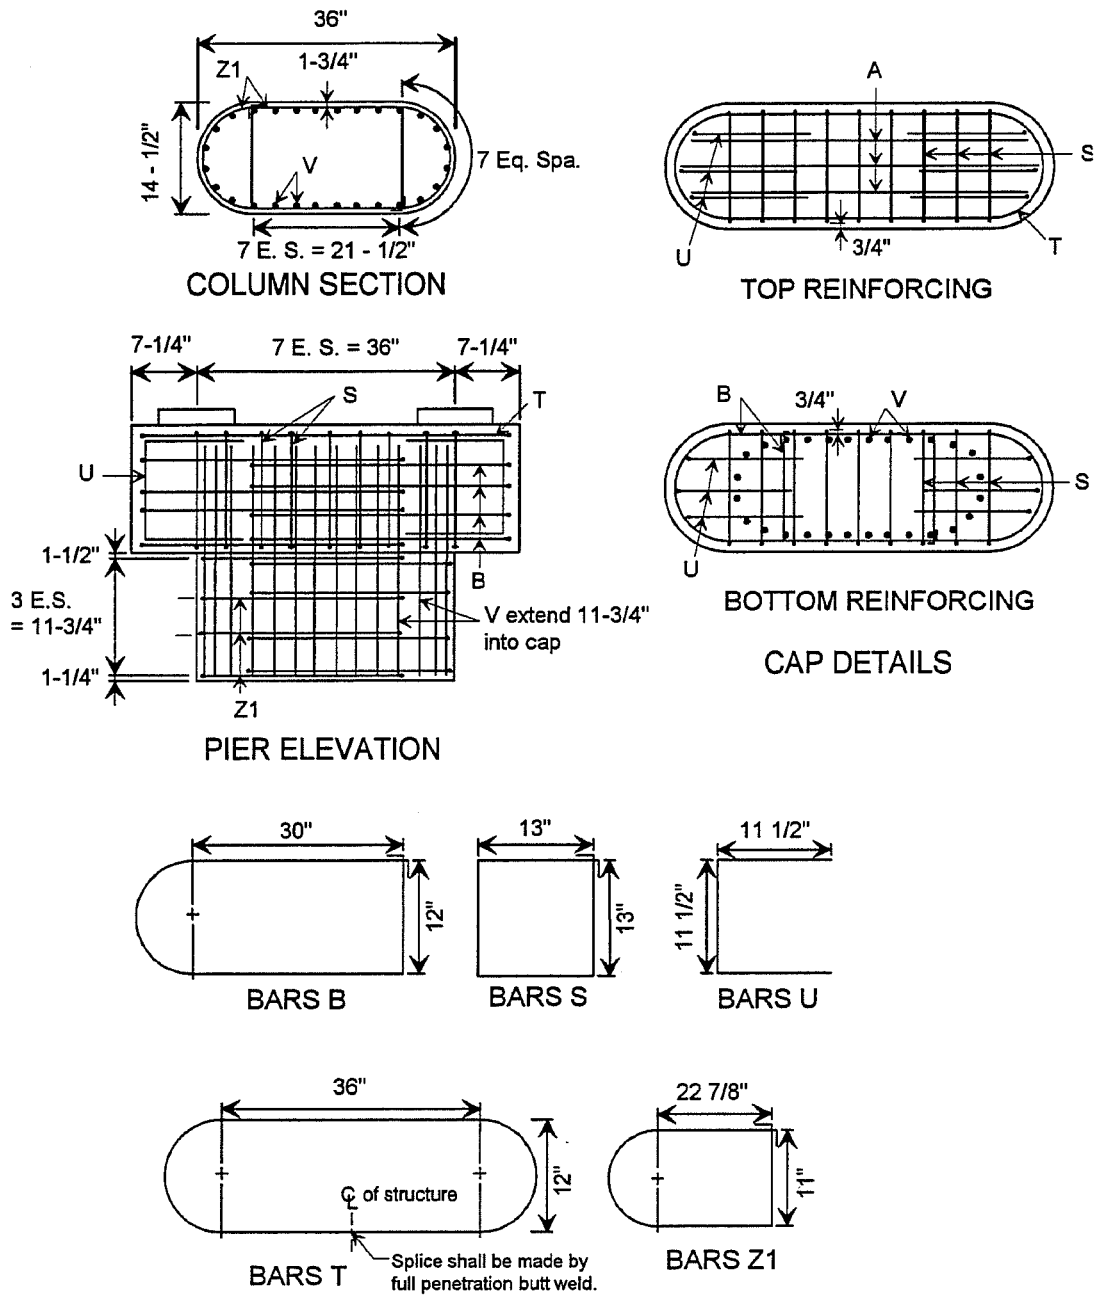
Steel Reinforcing Detail for the Standard Scale Specimen (Pier A2)
